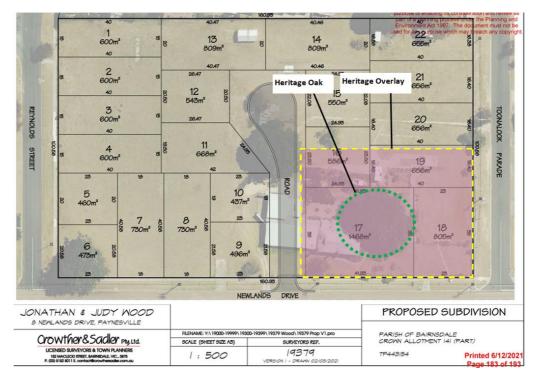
Proposed Plan of Subdivision (Yellow, green annotation and labels added)
